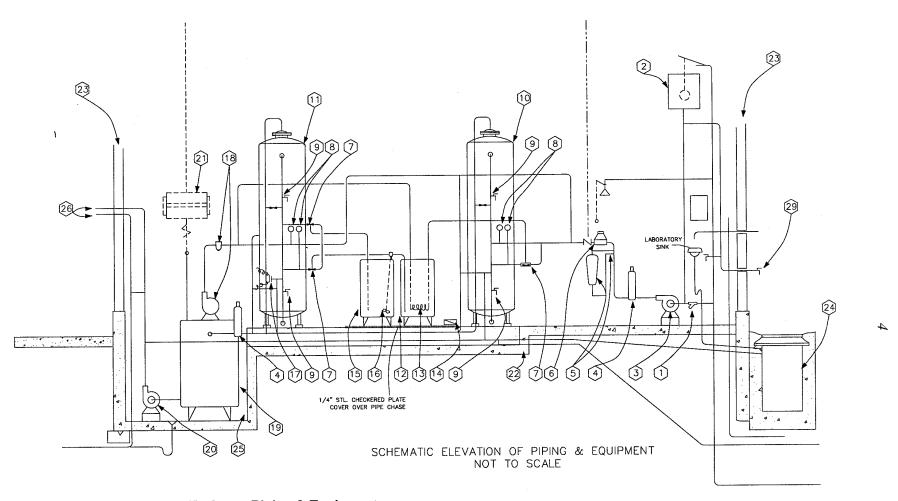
Building 594 Ion Exchange Piping & Equipment
